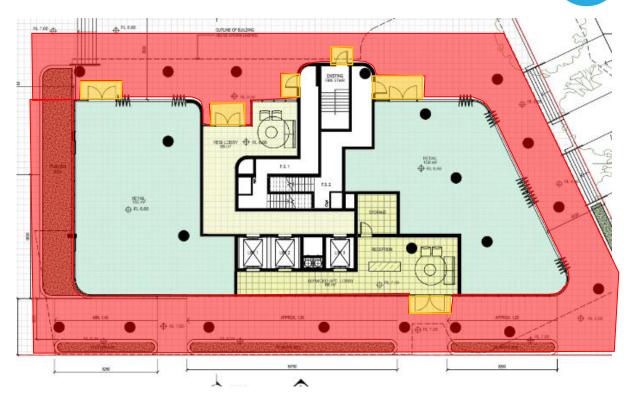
Schematic plan view of proposed development with recommended wind criteria overlaid on the ground floor of the proposed development
